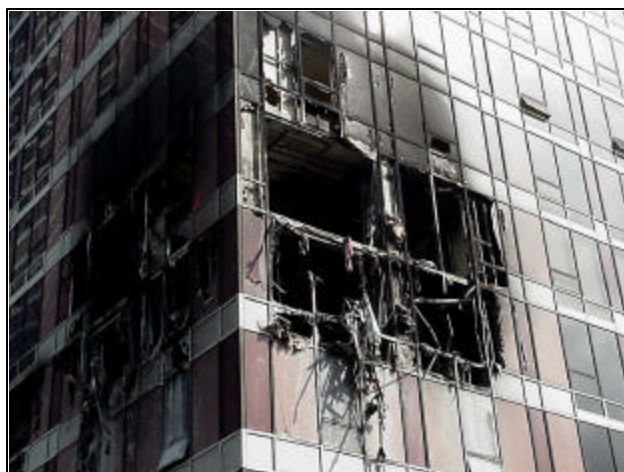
Northwest Corner of Building Figure 3-Curtain Wall-Floor Slab Gap
